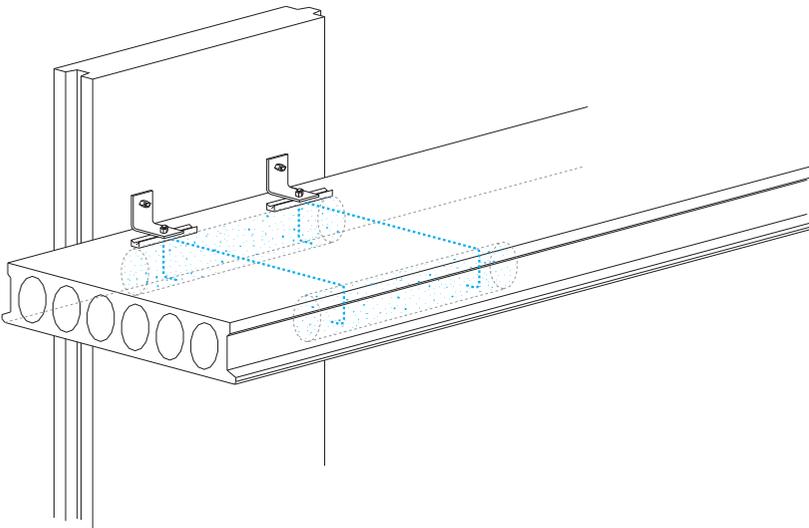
Example of the proper anchoring of boltable profiles on the outer edge of a hollow core slab.
